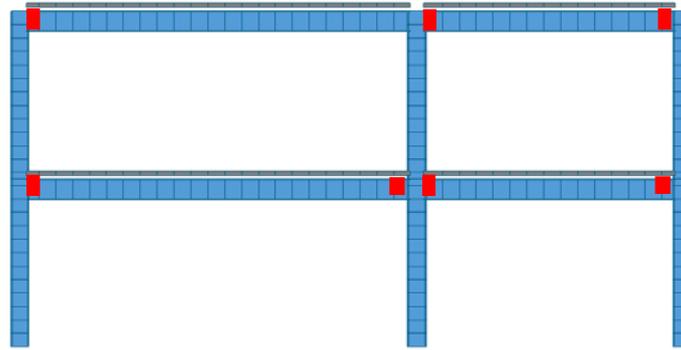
location of the plastic hinges at failure for the “Bochum” structure
